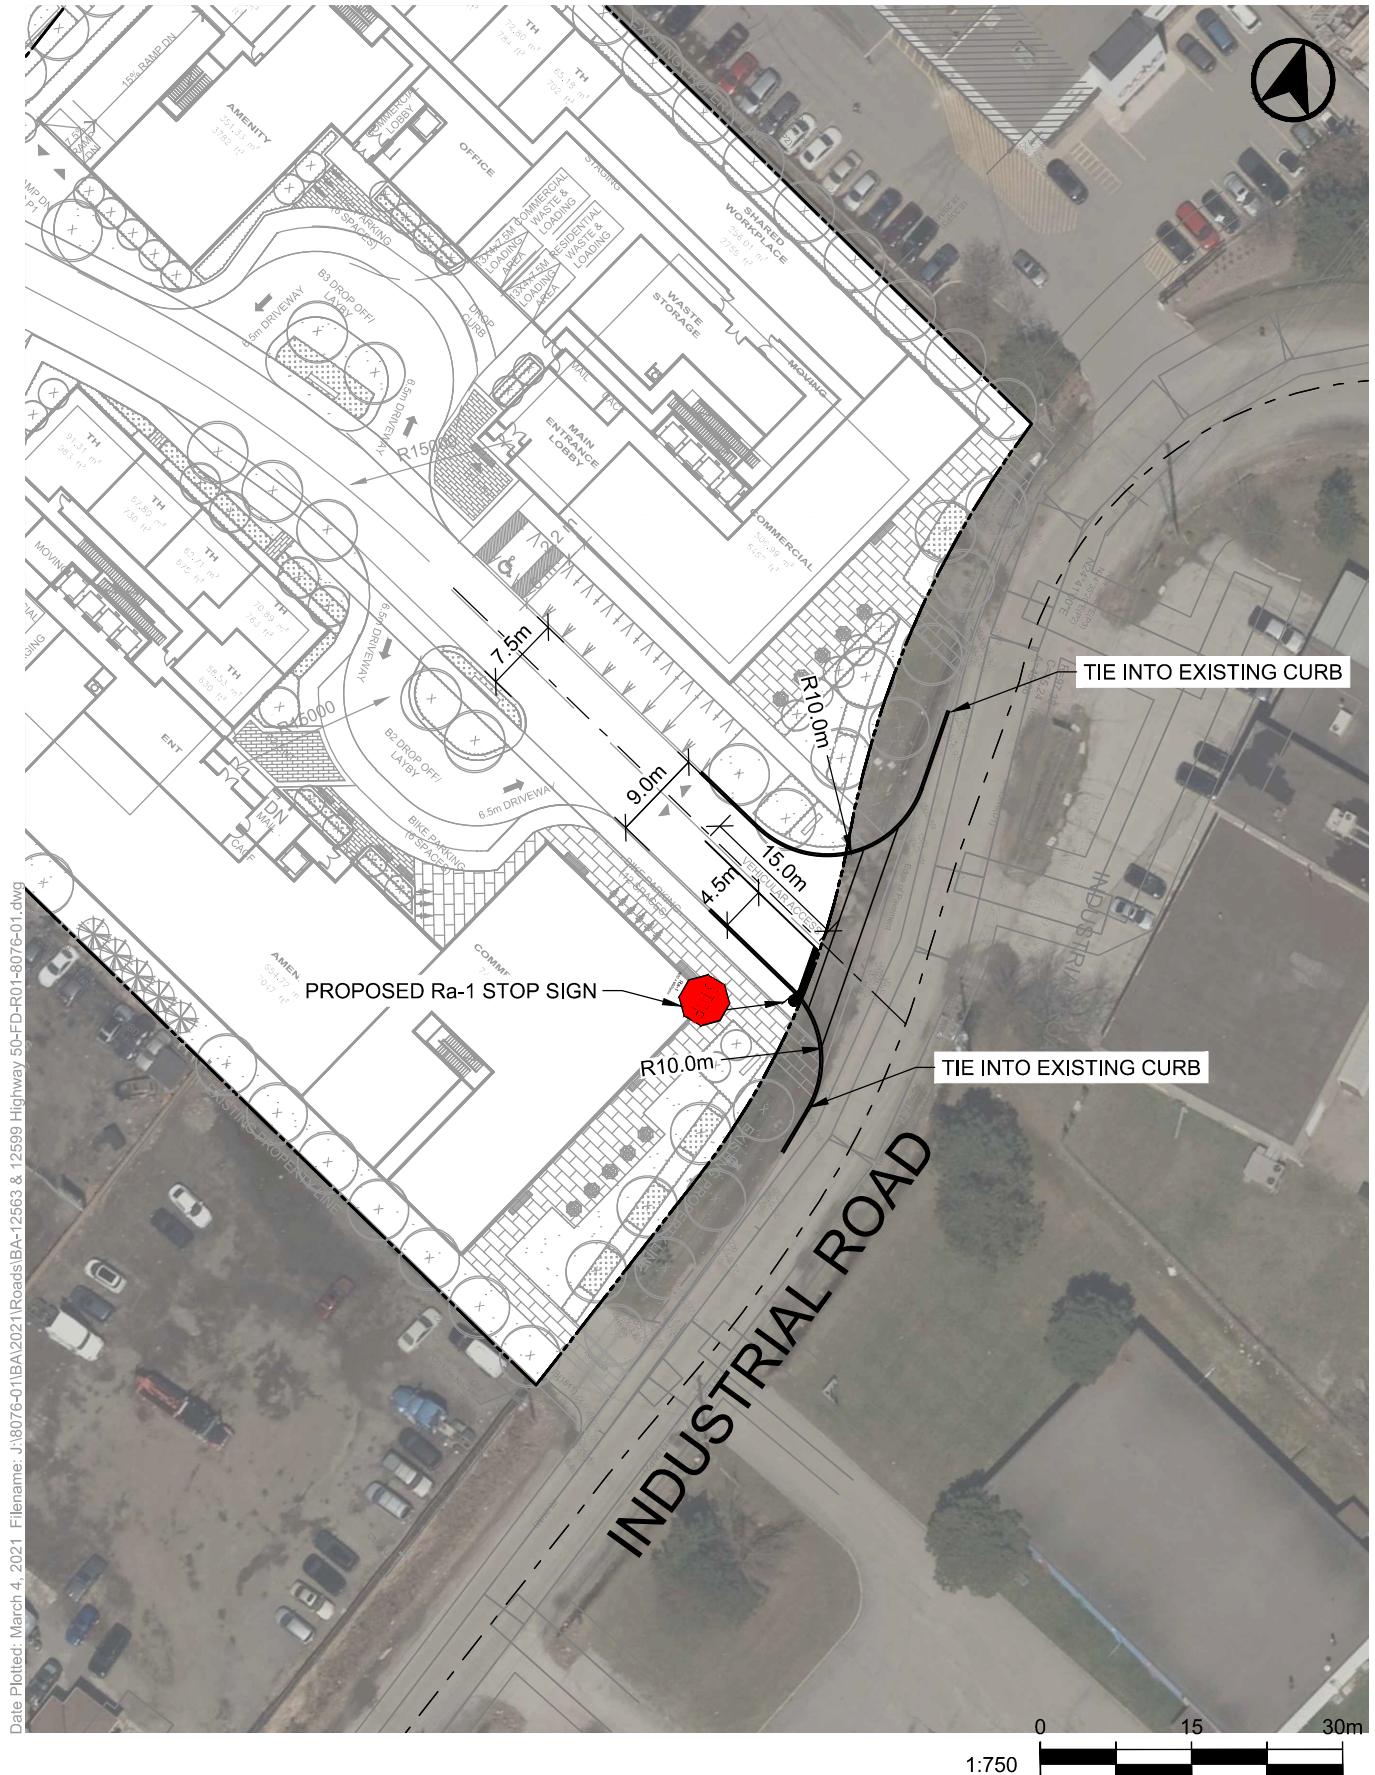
PROPOSED ACCESS CONFIGURATION AT INDUSTRIAL ROAD & SITE DRIVEWAY
